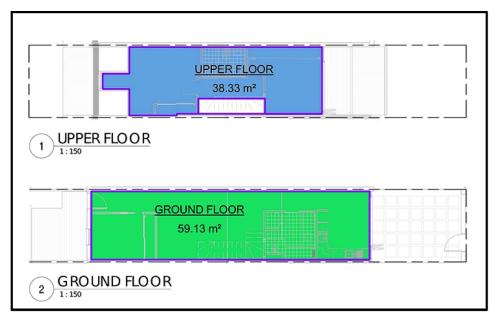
Gross Floor Area Calculation Plans (Source: 3 Lines Architectural Designs, 2020).
